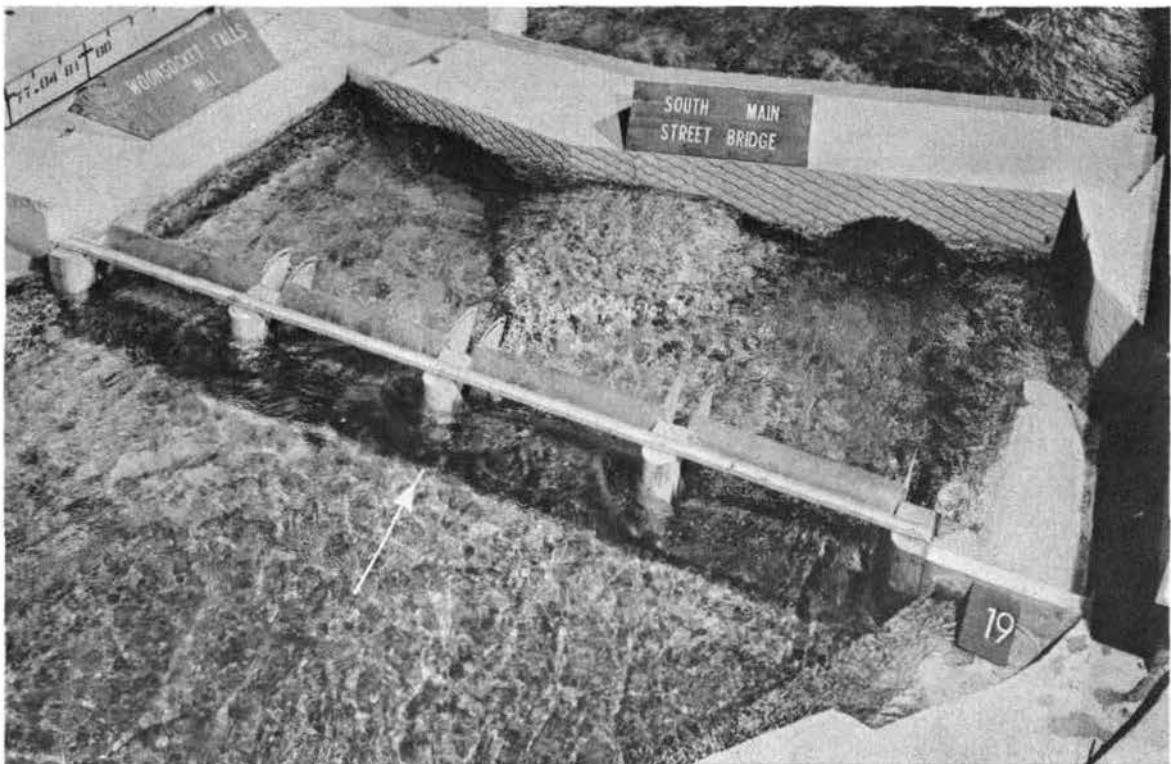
Treatment of rock between Woonsocket Falls Dam and South Main Street bridge for Plan A. Compare with photograph 3
